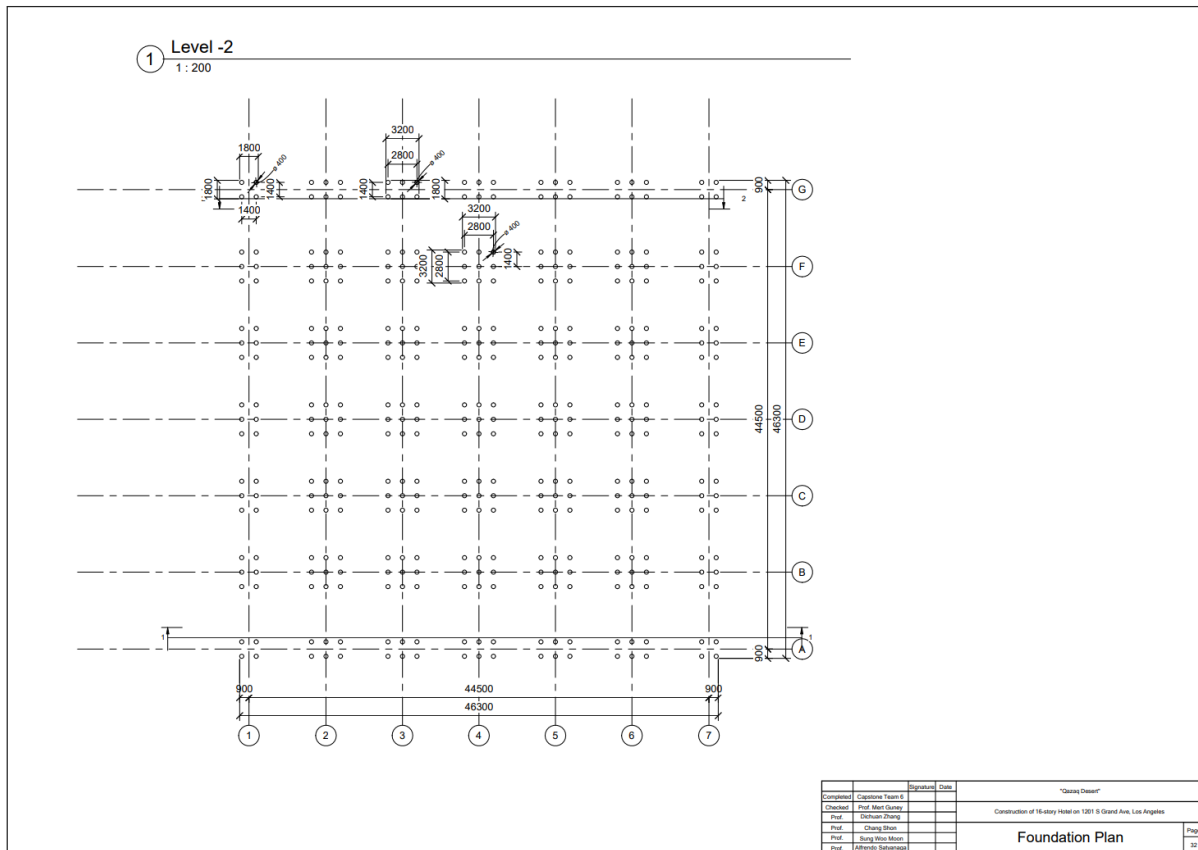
Technical drawing of the foundation plan
